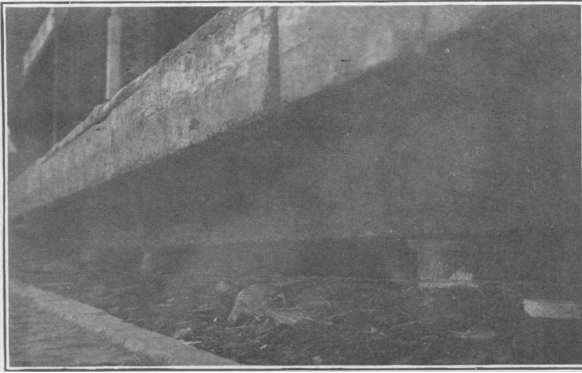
REAR OF SHED SHOWING OPENINGS BENEATH FLOOR.
